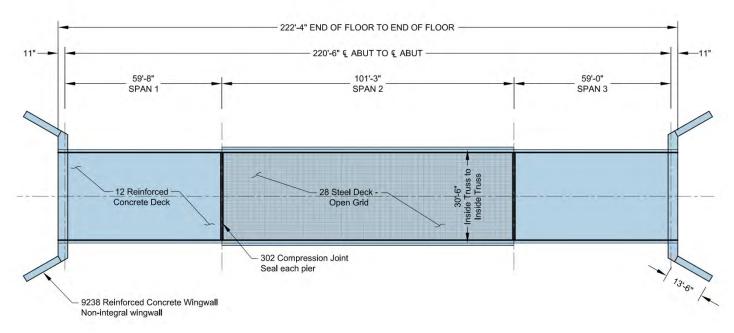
EI.24.10- 1: Elevation view of steel truss bridge
